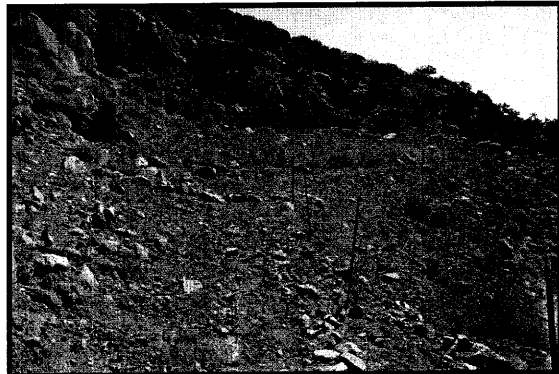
Des-Bee-Dove Mine Site - Switchbacks
